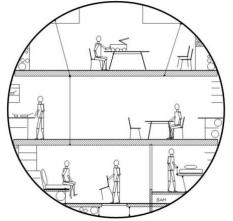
Three-Floor Workshop, built into a Starship. (Mackenzie, Mars Foundation)
